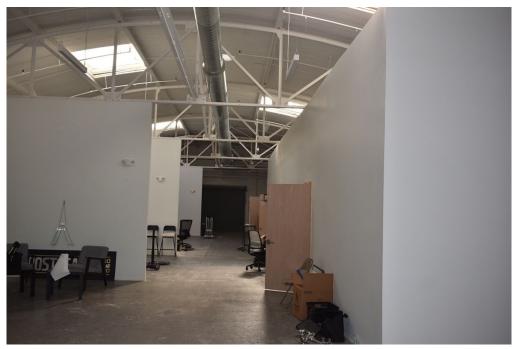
Sections 12 1113 Providence, view southeast (Photo taken: April 2024)
